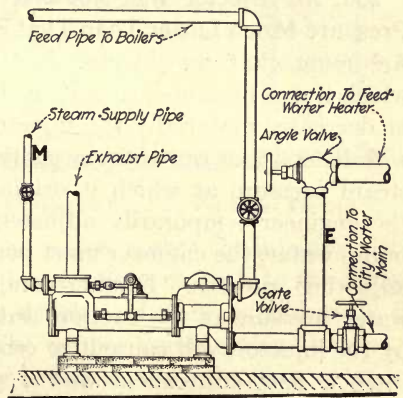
A Direct-Acting Steam Pump For Boiler Feeding.
